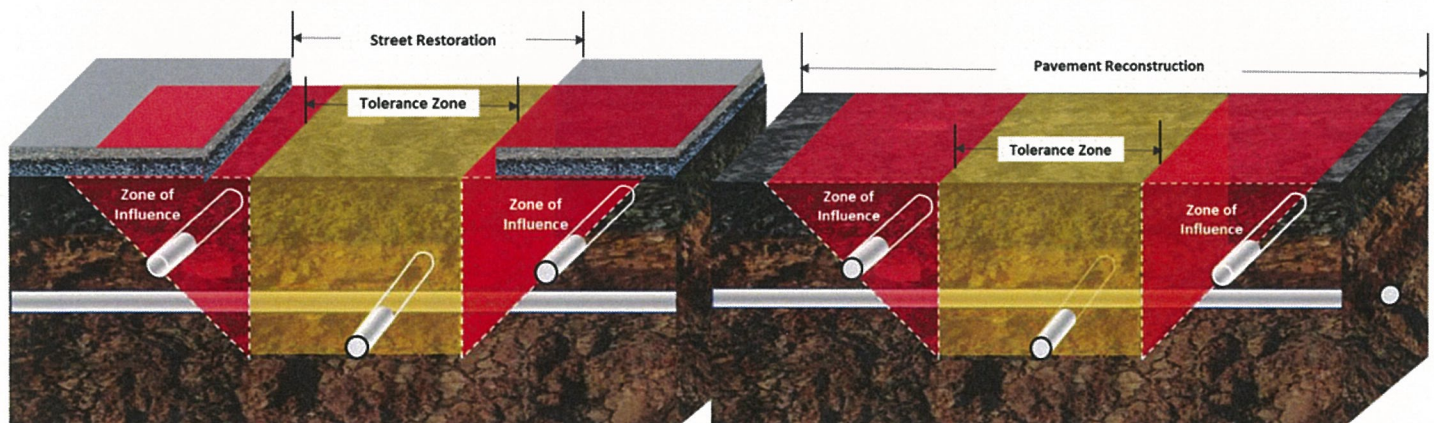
Excavation with Street Restoration and Pavement Reconstruction
